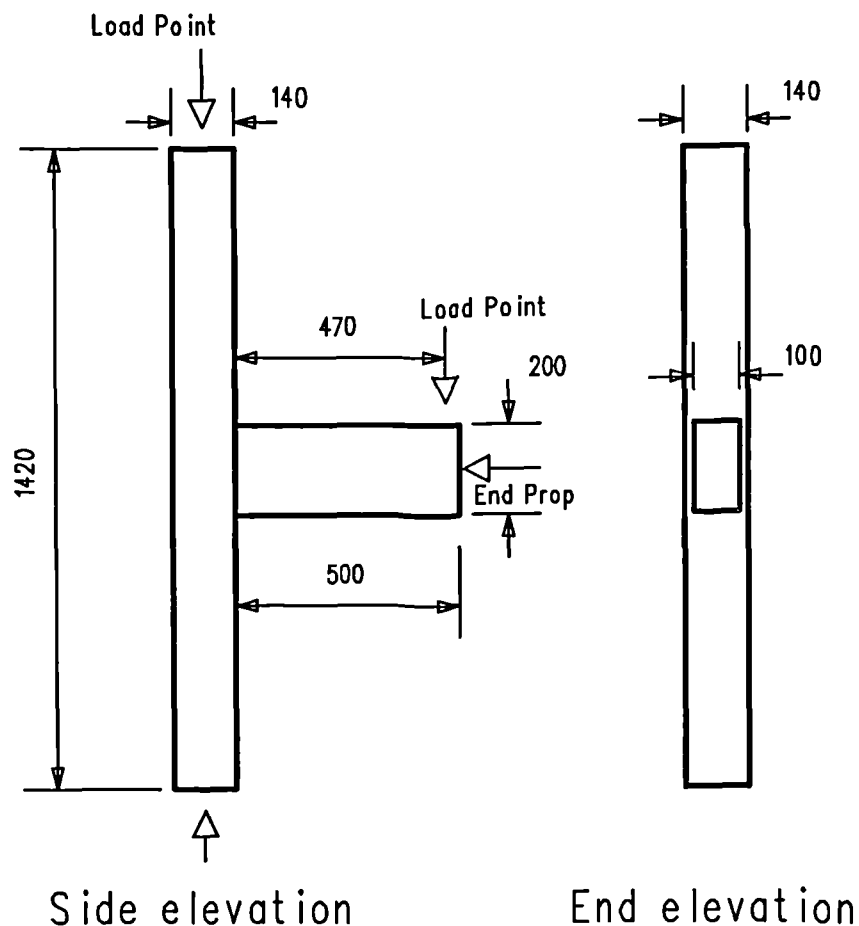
Specimen layout (dimensions in mm) - Taylor [1]
